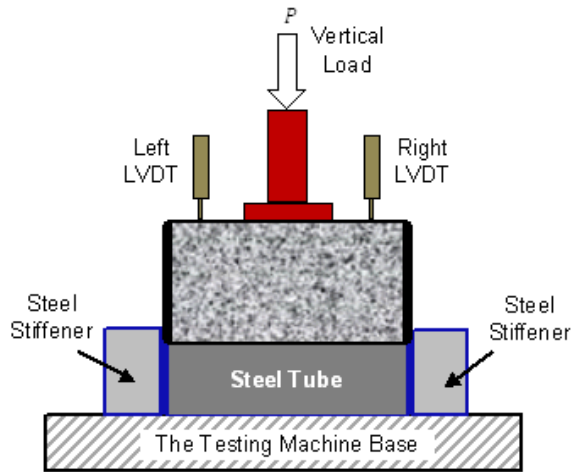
Typical Specimen and Method of Load Application in a 60,000-pound Baldwin-Lima-Hamilton Test Machine
